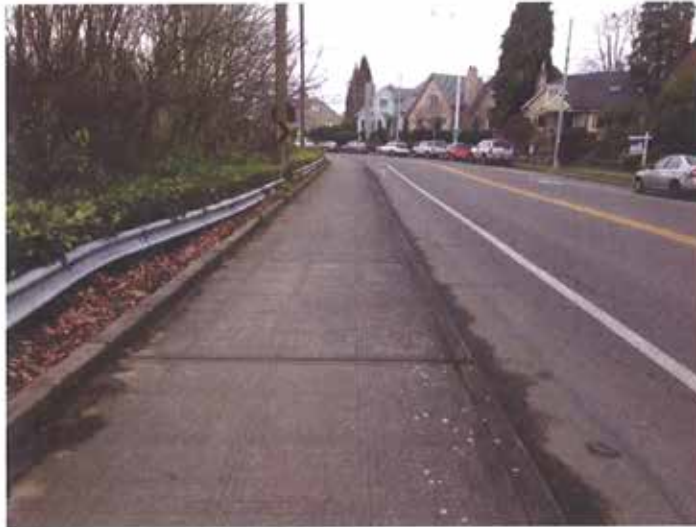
A: 31ST AVENUE SIDEWALK VIEW LOOKING SOUTH
